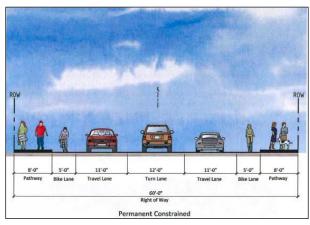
Cross-section from Streetscape Design Plan Streetscape Design Plan
